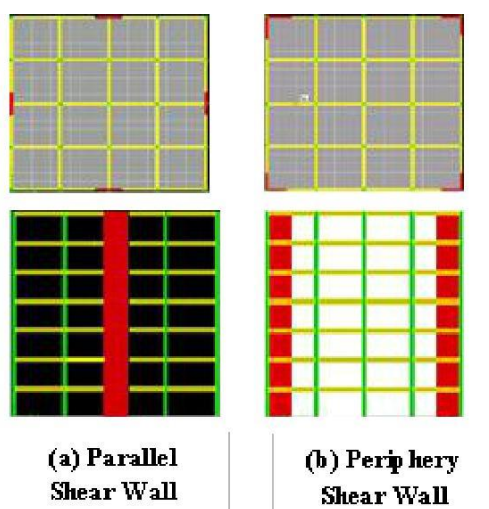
(a) Plan and elevation view for bare frame with Parallel shear wall (b) Plan and elevation view for bare frame with Periphery shear wall
